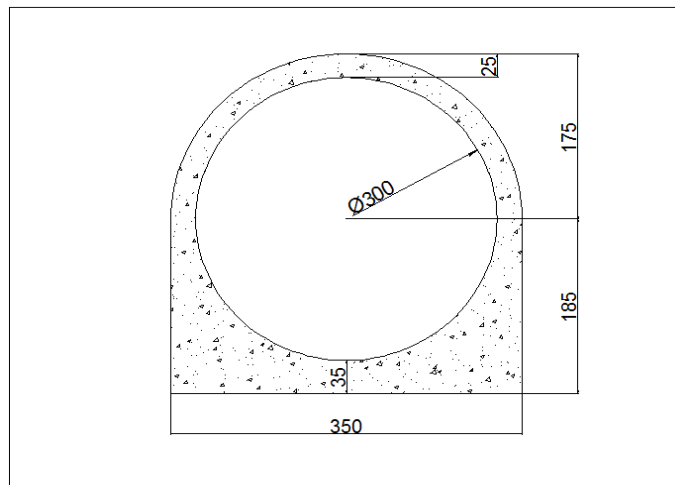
Tunnel Cross-section Recommended by EİE (All dimensions are in cm)
